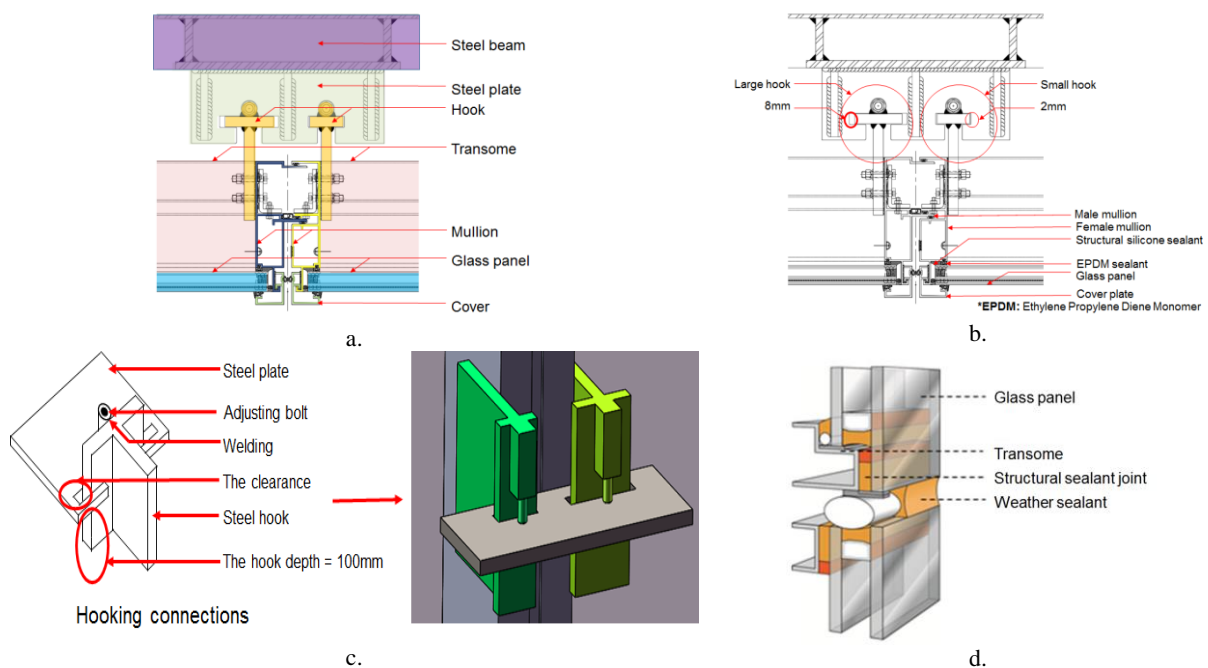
(a) Plan view of mullion; (b) Sealant details; (c) Hook details; (d) 3D view of transom [26]
